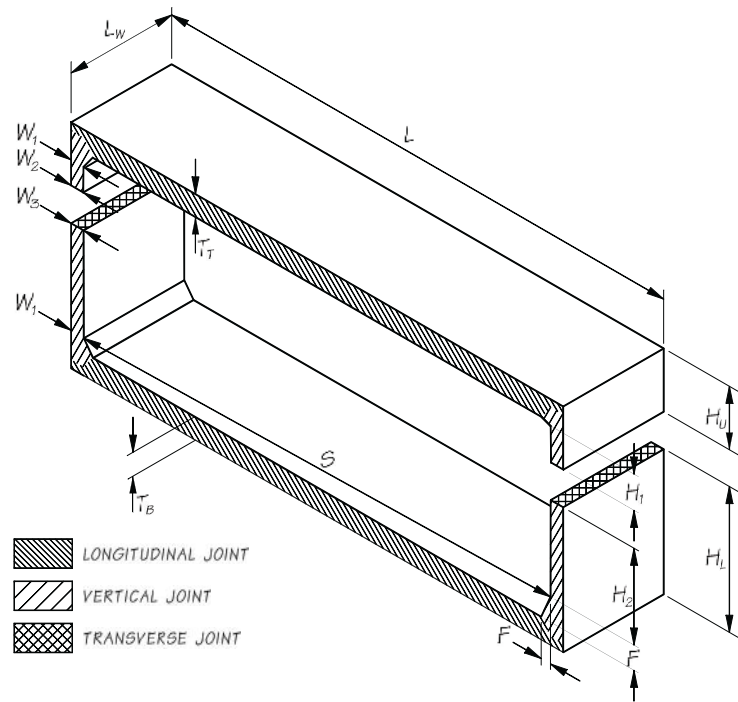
Details of the Washington State Department of Transportation standard precast concrete split-box unit. Joints are designed to carry the applied horizontal and vertical forces, and they are formed so that they can be assembled to transmit those forces and provide joint tightness. All Photos and Figures: Washington State Department of Transportation.
